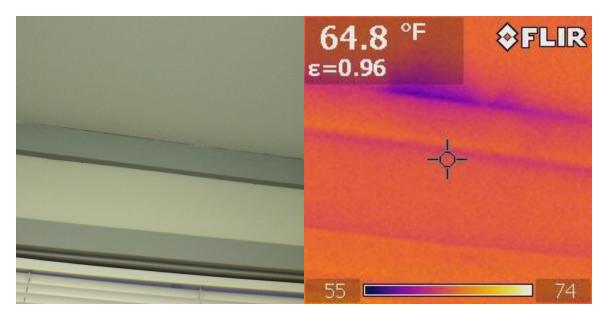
Infiltration Detection—Wall and Ceiling Seam
